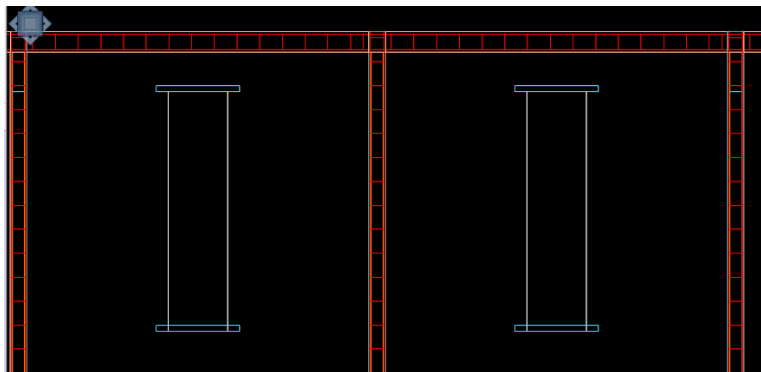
16. Stirrups, Longitudinal and Joint Area Reinforcement of RC Buildings Numerical Model
